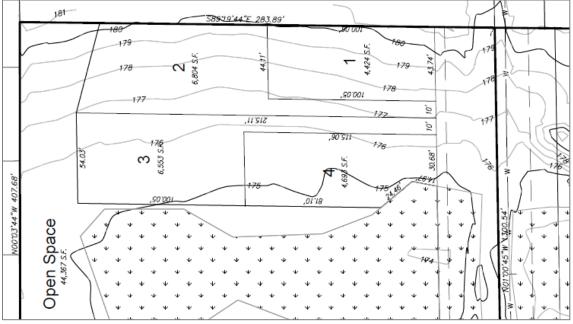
PRE 21-25 draft subdivision plan
